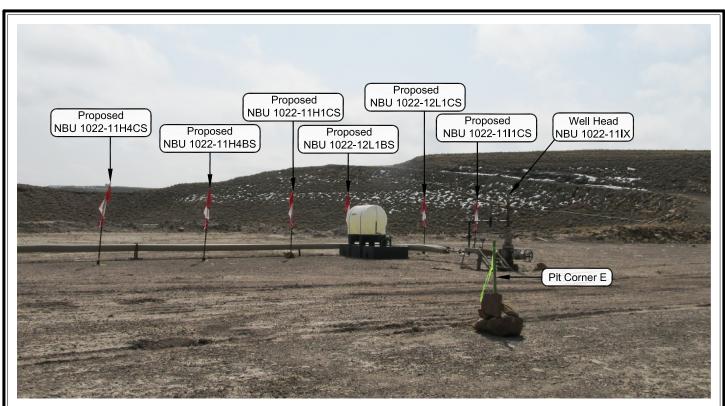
PHOTO VIEW: FROM PIT CORNER E TO LOCATION STAKE
